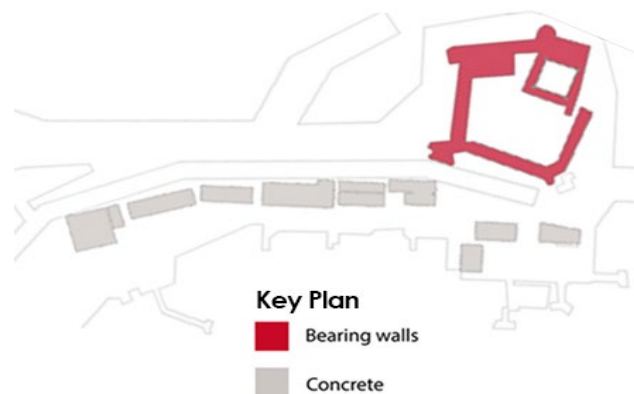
Structure material of the buildings surrounding Qaitbay plaza, Source: AutoCAD tracing modified by researchers.
